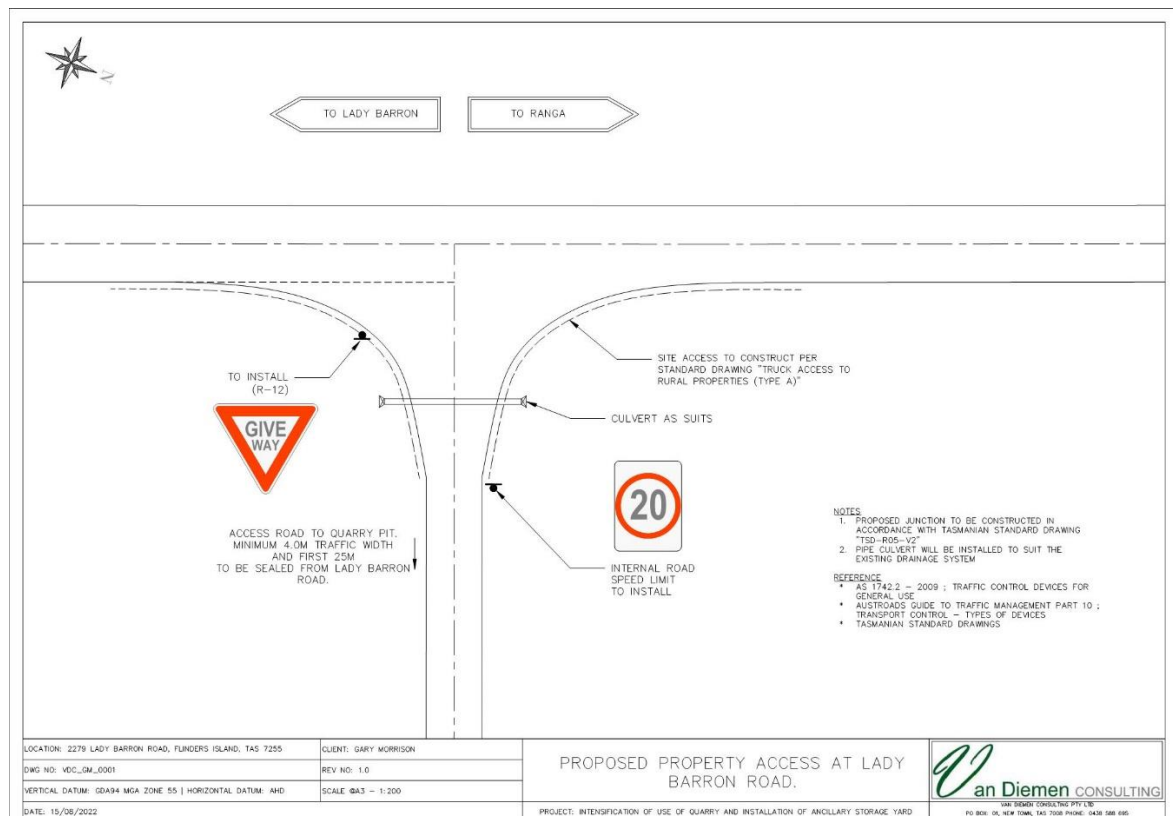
Proposed property access to Lady Barron Road from TIS (page 17)
